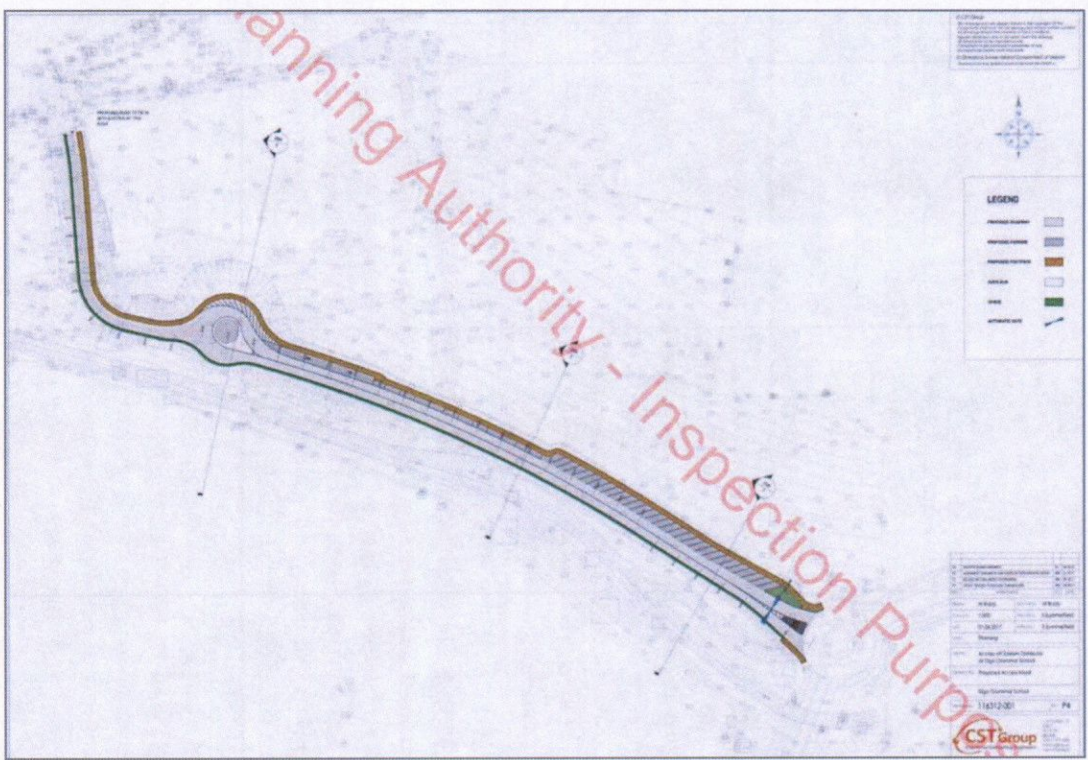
Proposed Site Layout (Source: Envest, 2017, Screening for Appropriate Assessment report for the proposed Sligo Grammar School Access Road).
